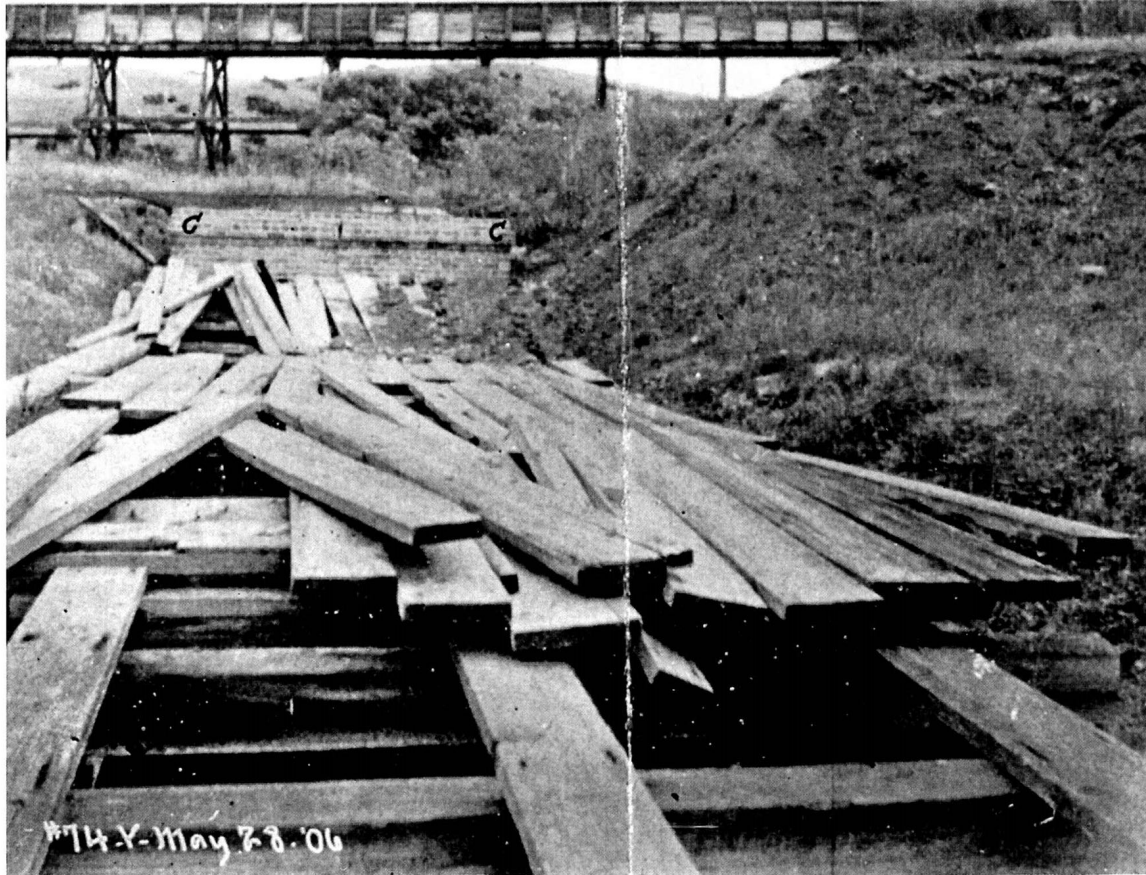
Damaged Exterior of Wastewater Exit Flume, Looking Northeasterly. Undamaged Portion of Elevated Stone Dam Flume in Distance (photo: Schussler HS52)
